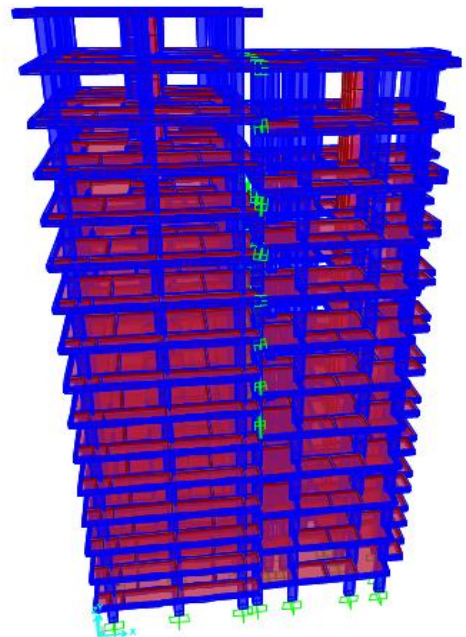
3D View of G+15 building with 3.2m floor to floor height & G+11 buildings with 4m floor to floor height with FVD
